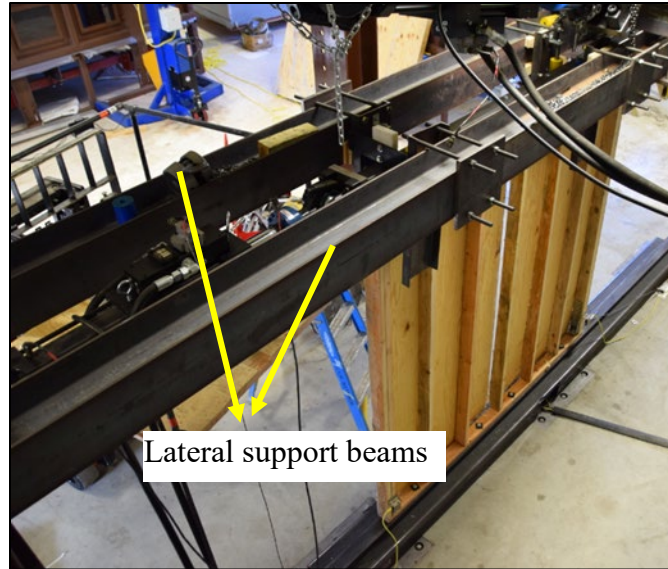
Shear wall test specimen laterally supported by top H-steel beams
